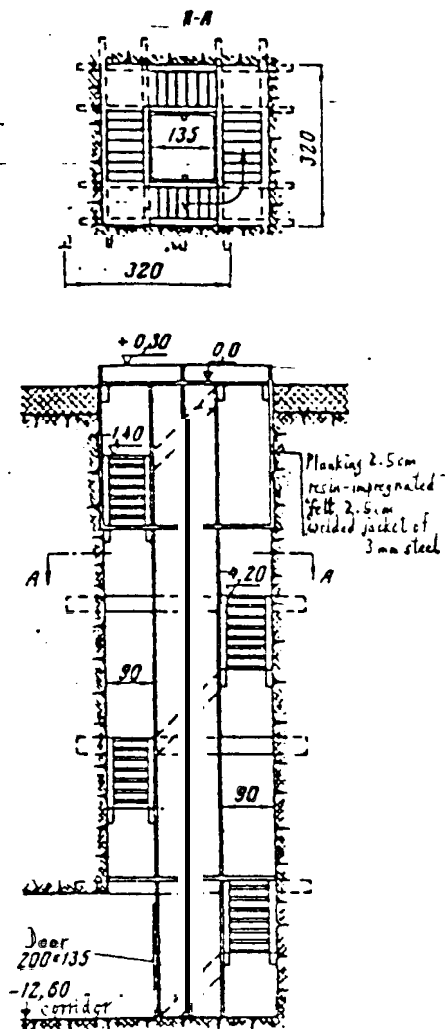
Loading shaft of shaft-type underground cold storage facility
